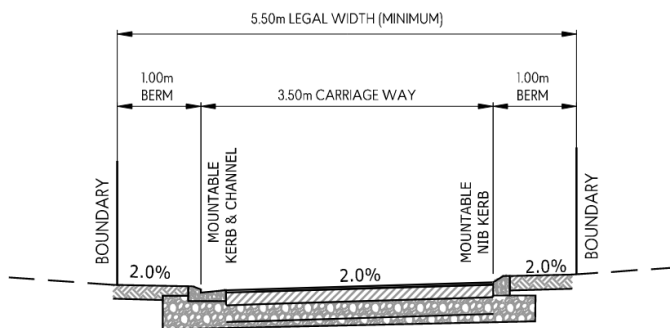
Typical JOAL Cross-Section (3) - 5.5m Minimum
